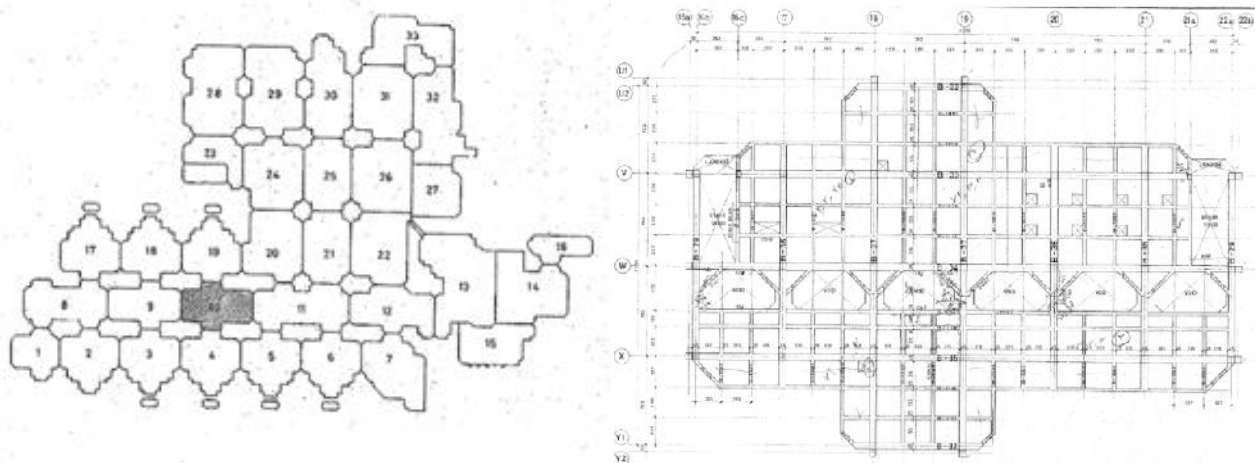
Site plan in Afzali Poor hospital of Kerman Figure 2. Plane in Afzali poor hospital of Kerman
